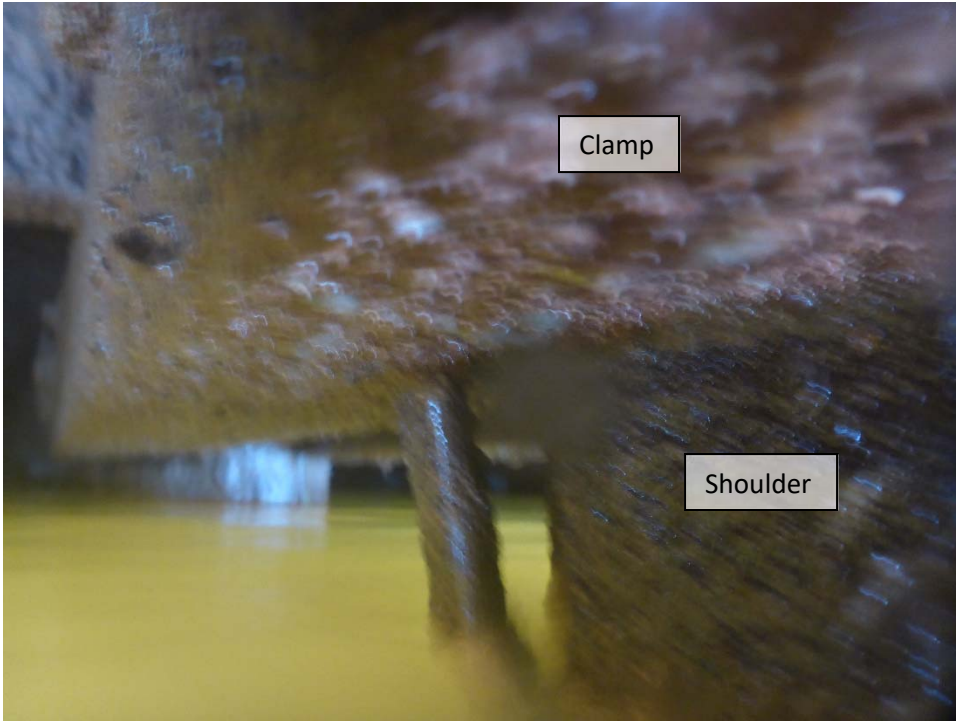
Bent 69S Pile A. Minor split at pile shoulder.
